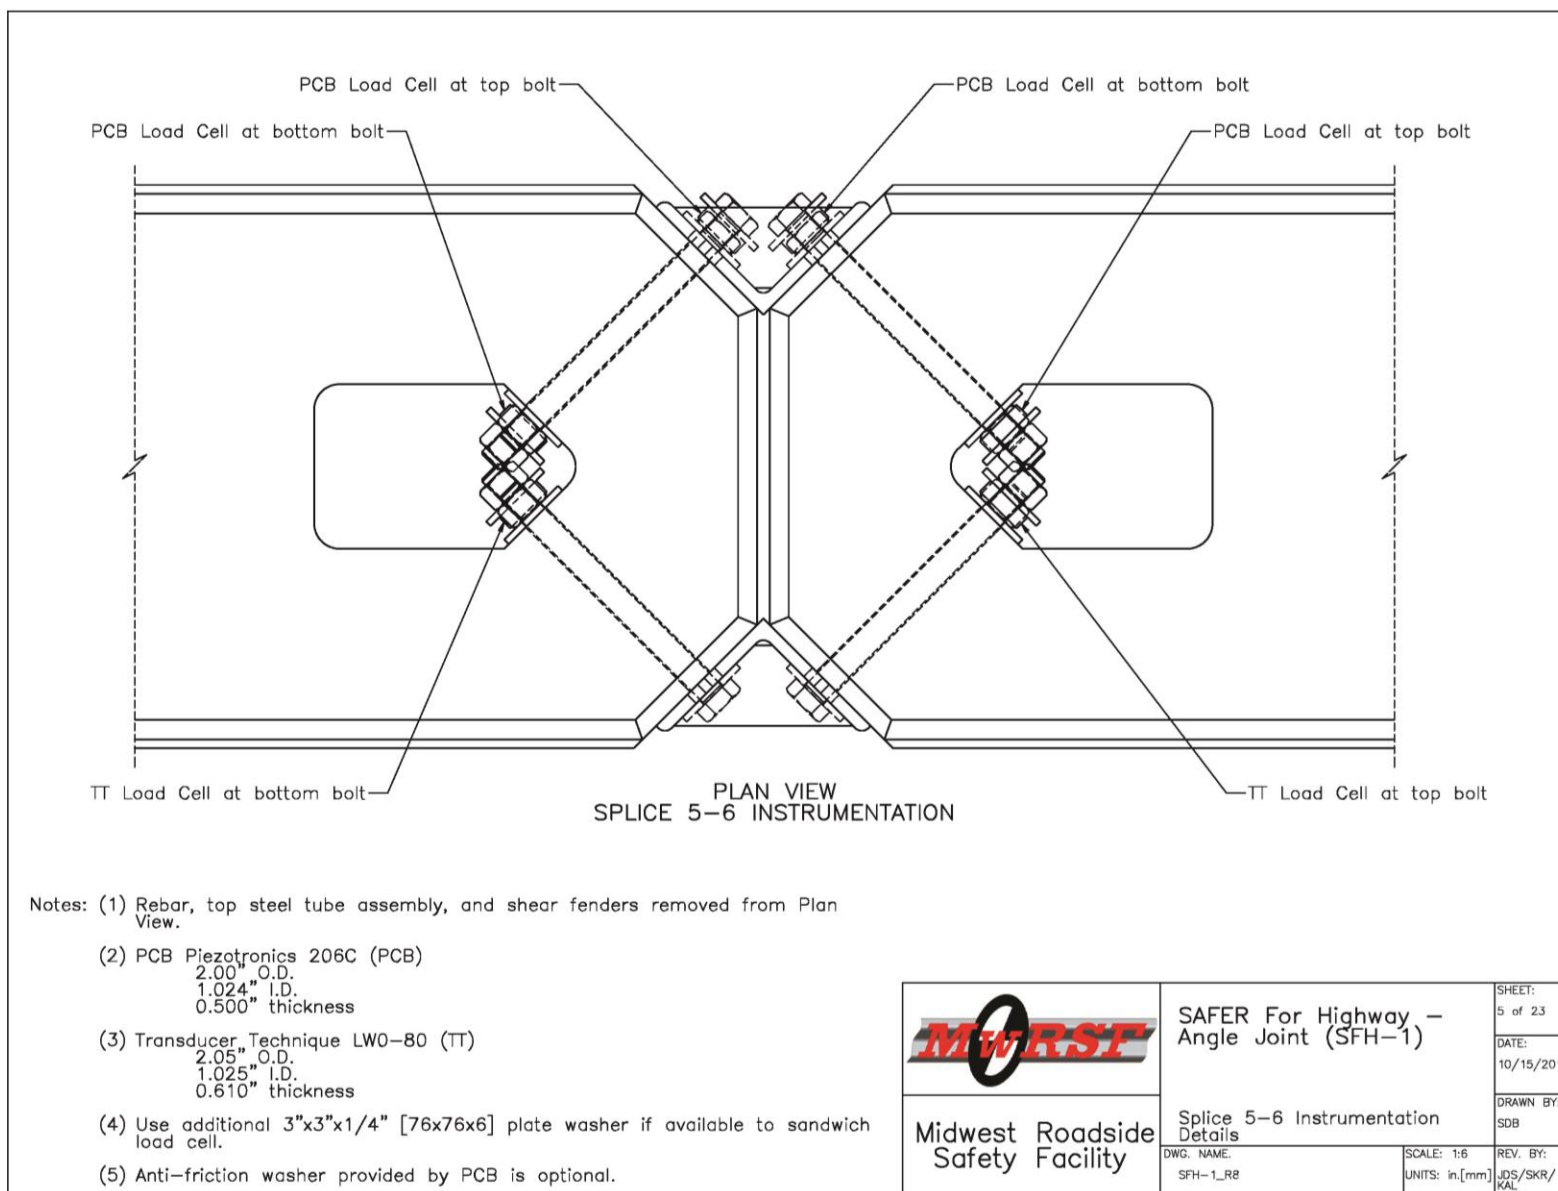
Recommended Barrier Design for Full-Scale Crash Testing, Instrumentation
